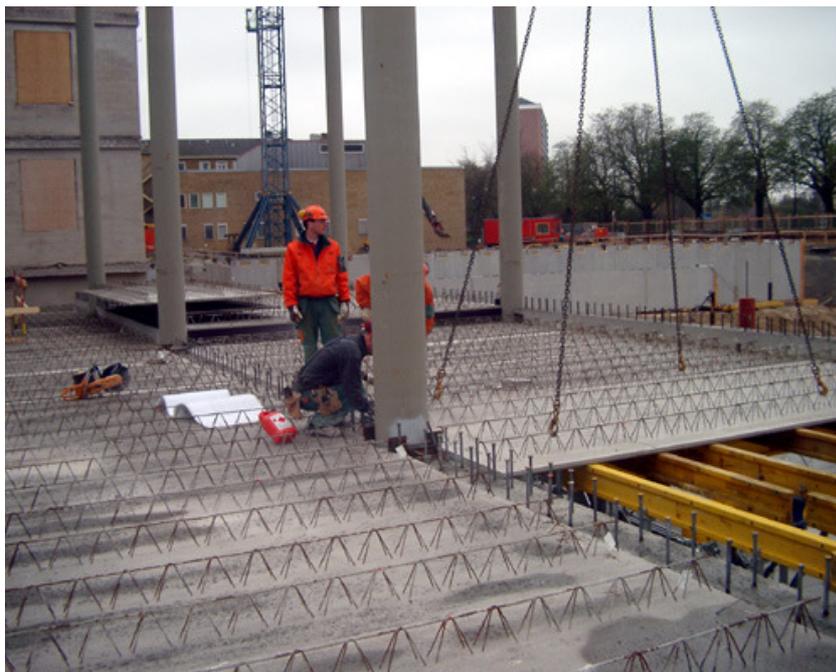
Installation of precast concrete formwork in Sweden [13].
